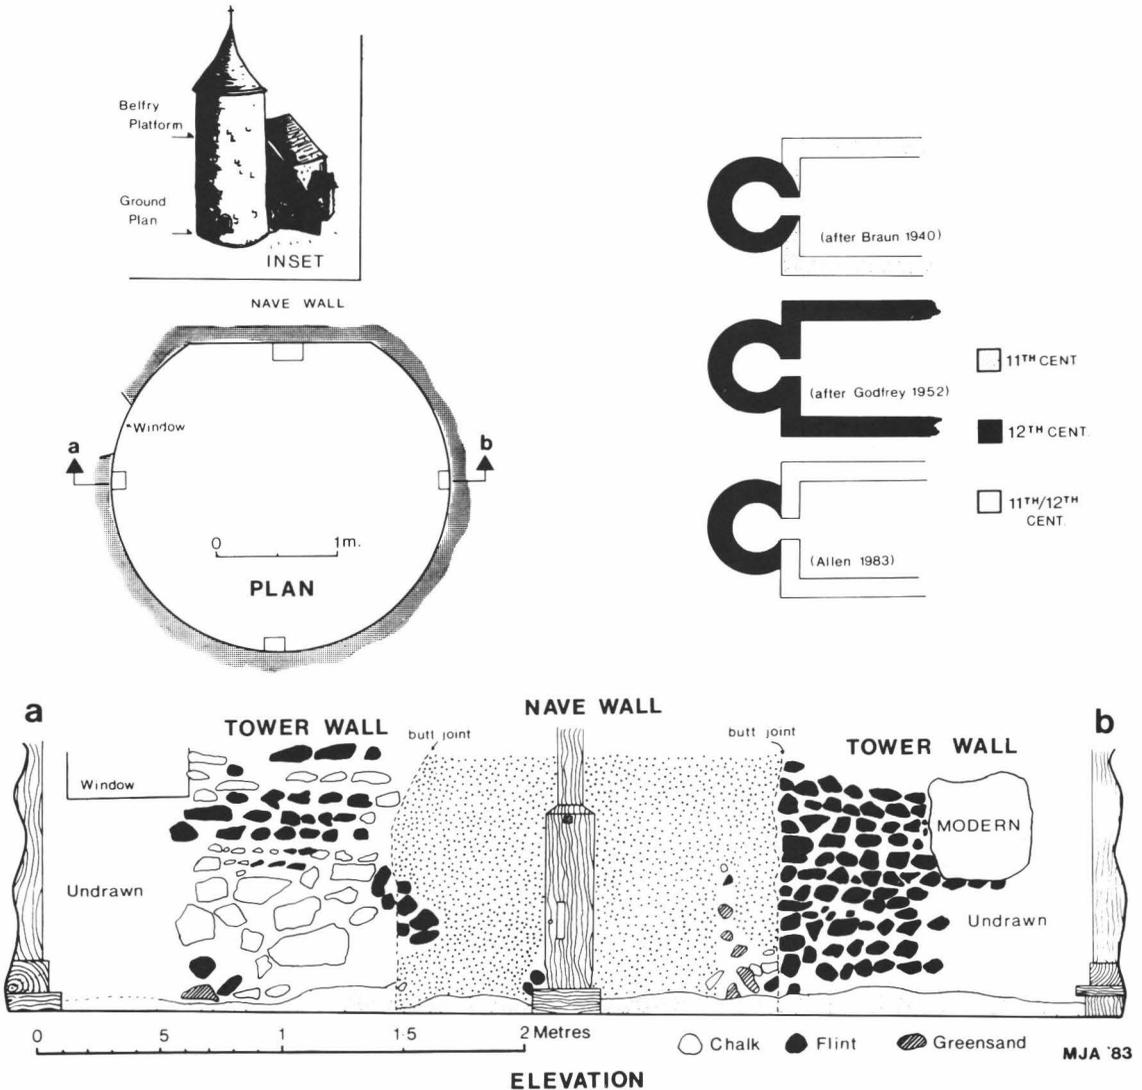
Southease church. (Tower plan and elevation at belfry level.)
